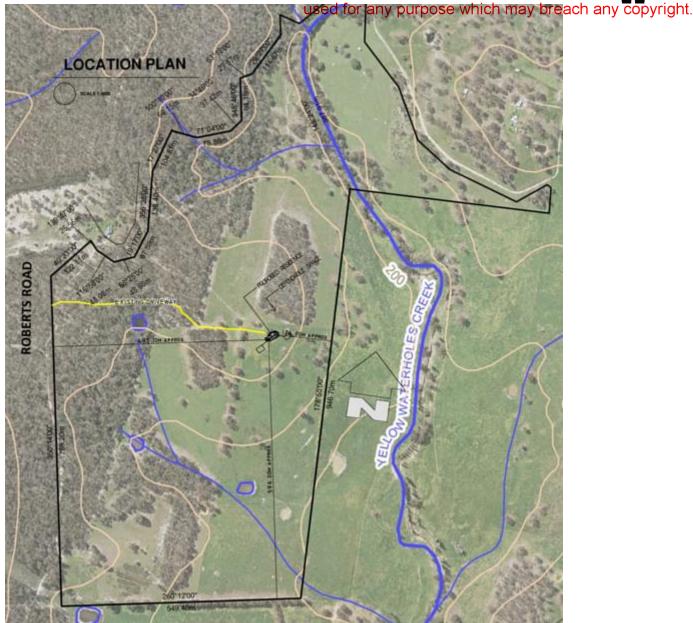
Proposed Site Plan for the new dwelling with the driveway shown yellow
